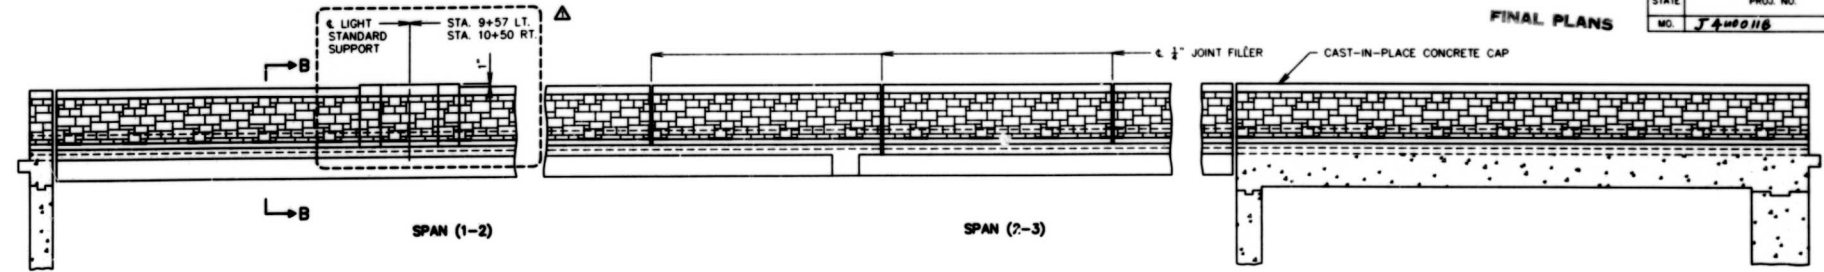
DETAILS OF STONE FACADE ON INTERMEDIATE BENT NO. 2
